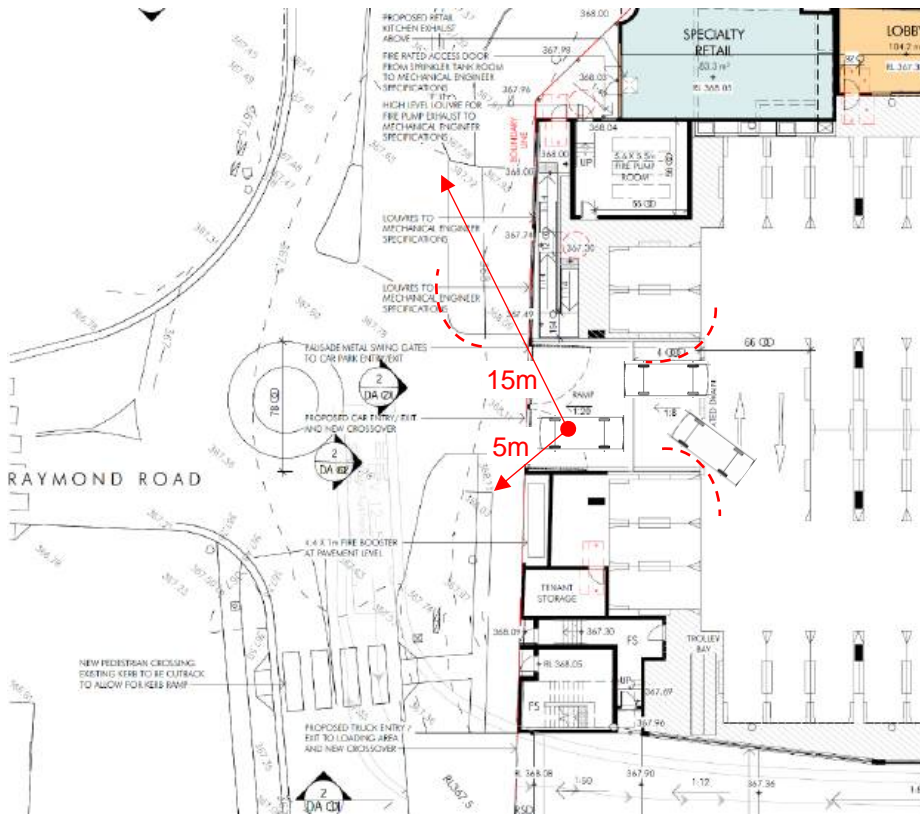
Roof Plan (1149 DA015 A) modified with vehicle outlines added
